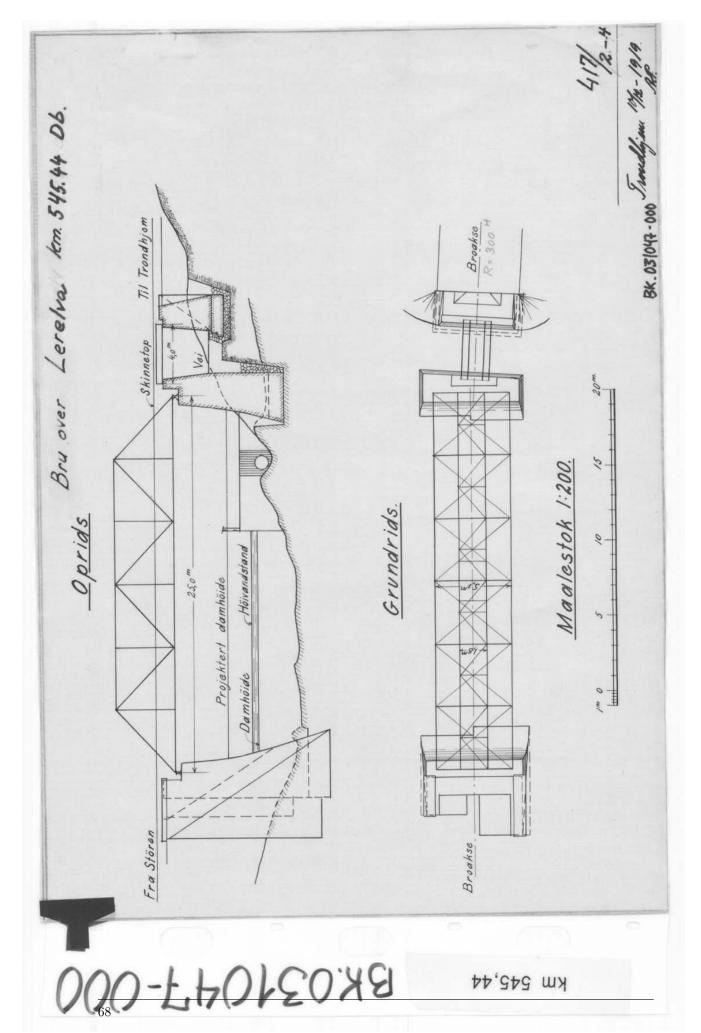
construction drawing showing general dimensions for lerelva bridge
